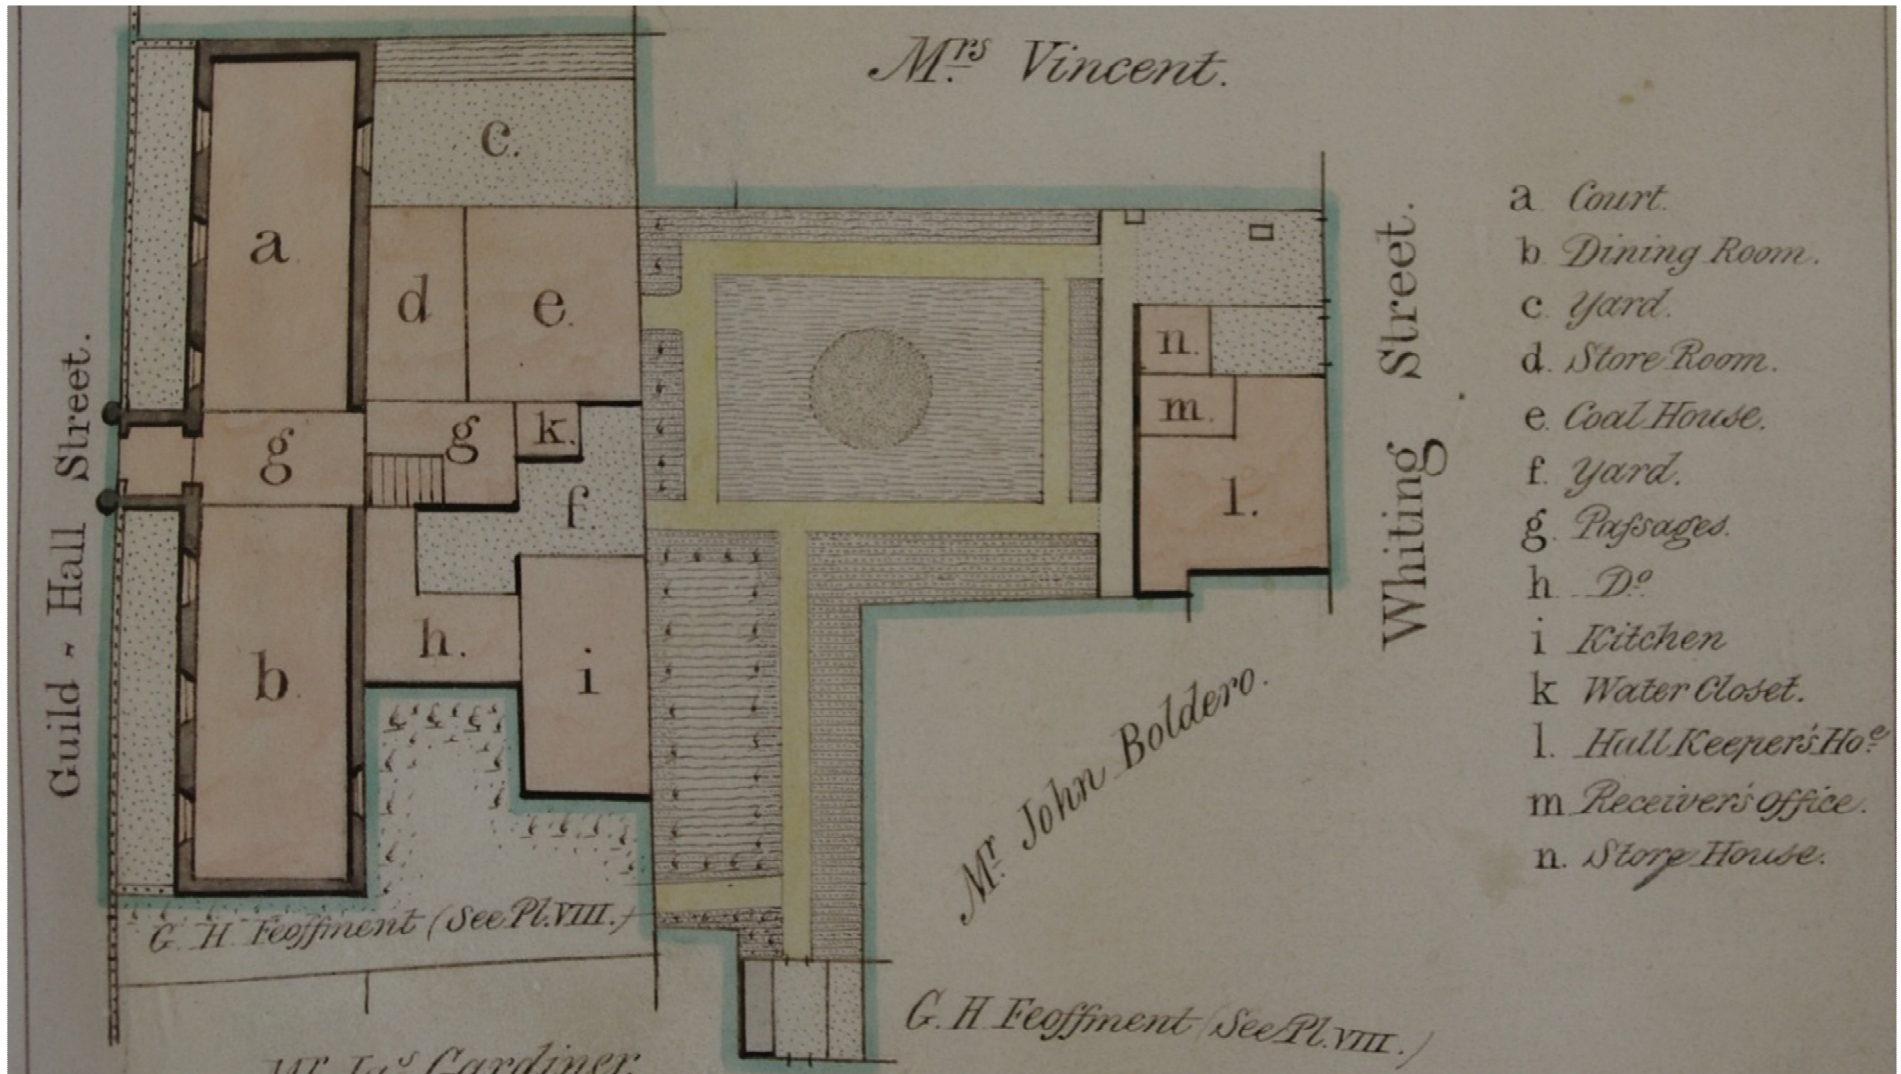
Plan from the estate book dated 1822 (BRO ref: H7/1/2) drawn after the acquisition of 79 Whiting St. and the relocation to it of the Hall Keeper. The plan shows the current large windows and the railings surrounding the front yard, whilst the access to the kitchen (i) from the central lobby(g) seem to have been cut off; the route from kitchen to banqueting room presumably being by the current fire-exit. A structure, probably the current raised bed, is shown alongside the north wall of the north yard (c); there is no entry to the north yard from Whiting St. and the door to the coal house(e) is centrally placed.
